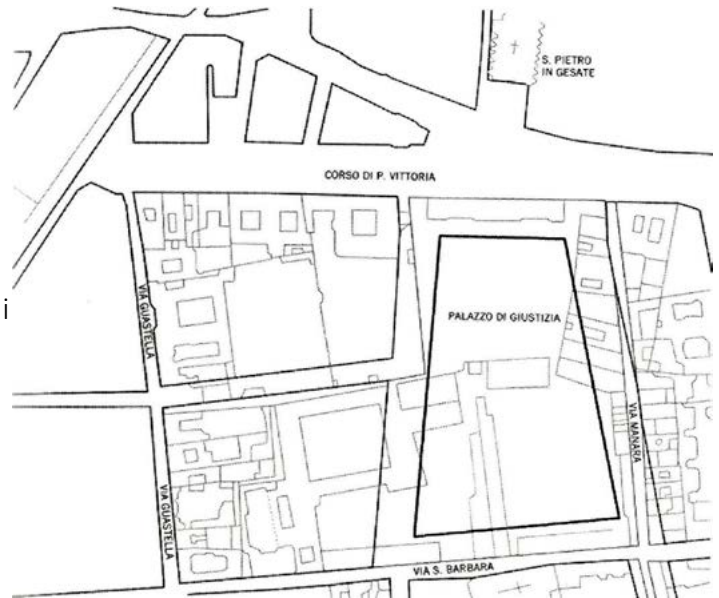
Site plan of the Courthouse from construction period.
